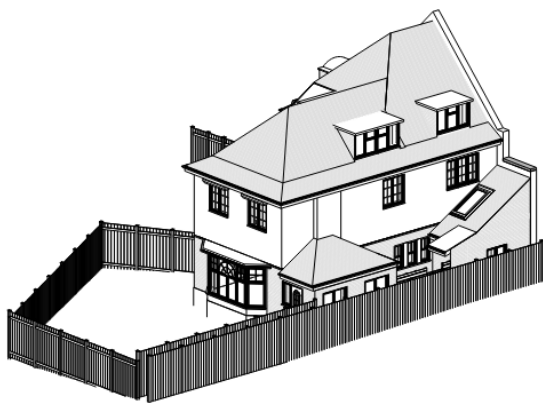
(above): Aerial view – Platt's Lane front elevation (source: Google 3D)
